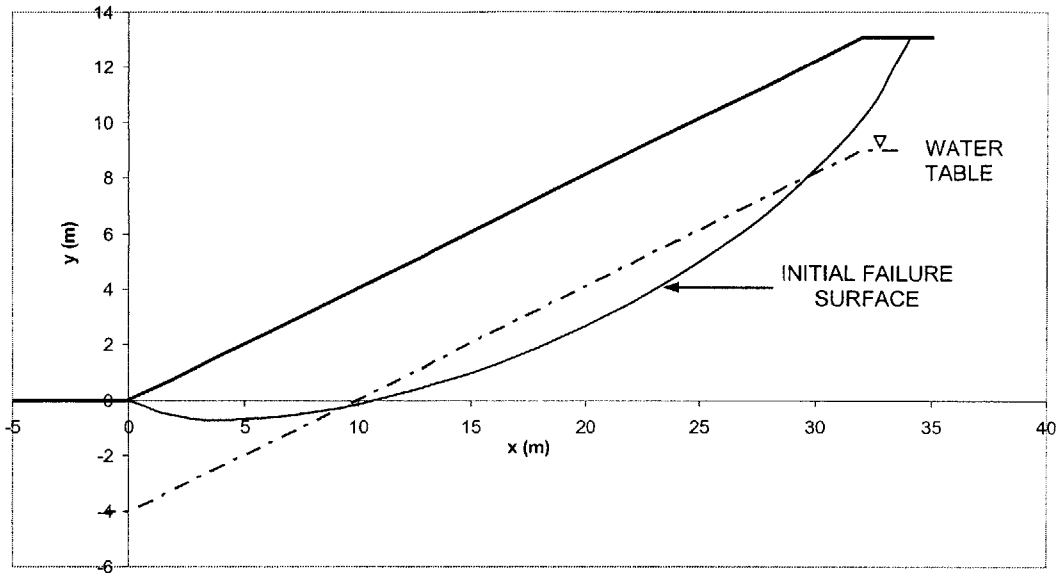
Slope Geometry, Hydraulic Condition, and Initial Failure Surface
